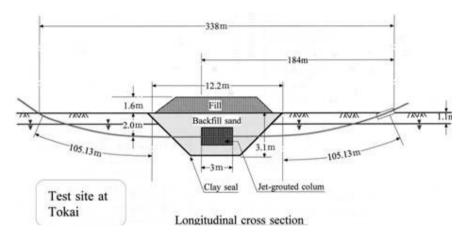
Pilot test site at Tokai for horizontally laid jet grouting.
